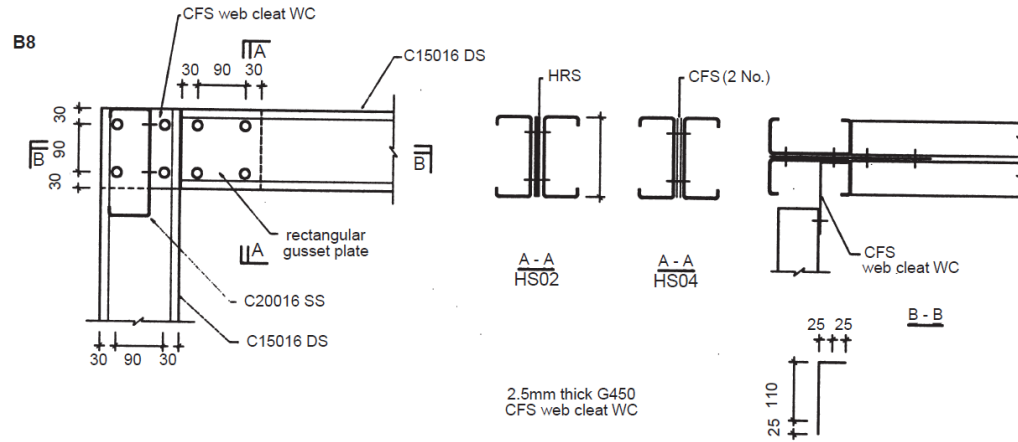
COLD-FORMED STEEL MOMENT CONNECTIONS (CHUNG AND LAU 1998)
